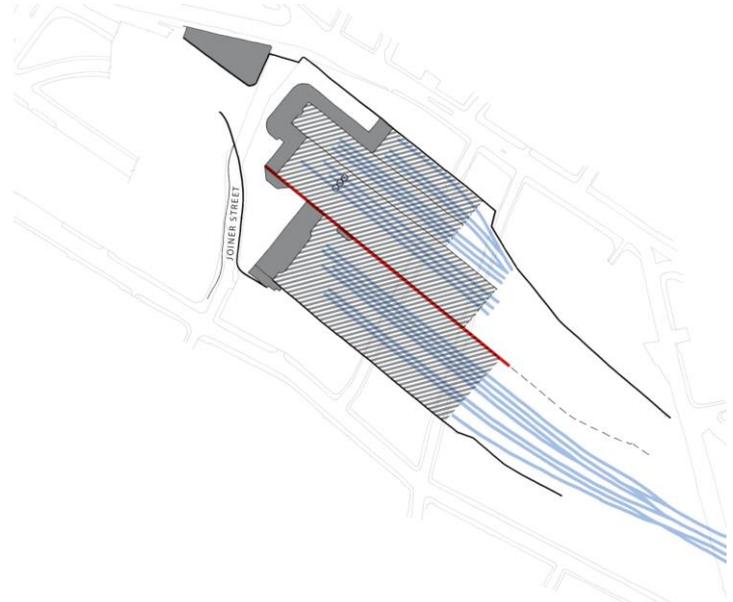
London Bridge station in 1860 (Alan Baxter)
